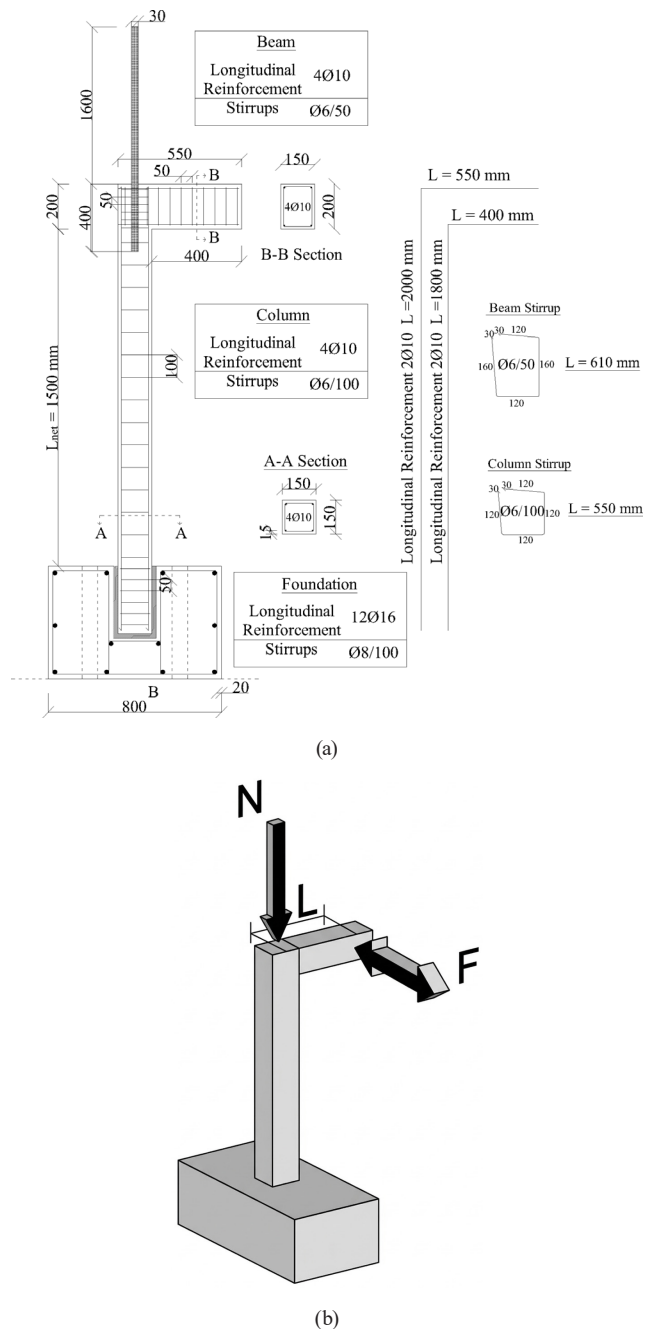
Specimen details: (a) Reinforcement; (b) Loading (all dimensions are in mm)
